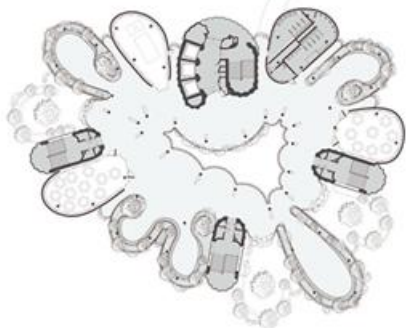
NTU first floor plan: (Fernández, n.d.)
